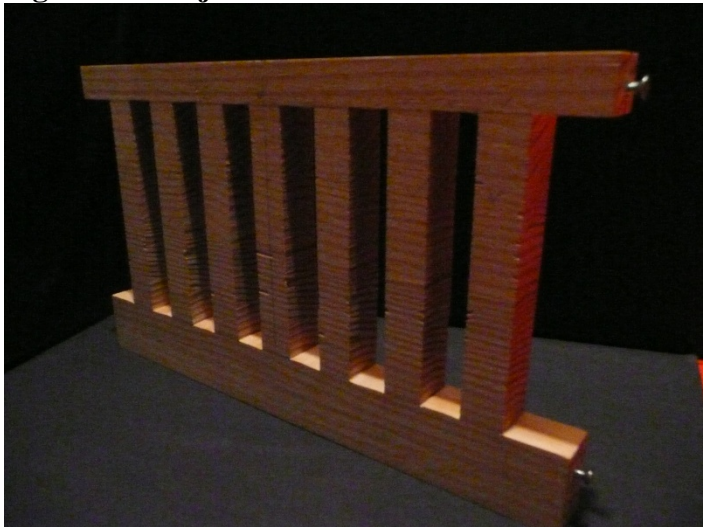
Channels for Front Rail and Holes to Adjust The Height of the Front Rail
